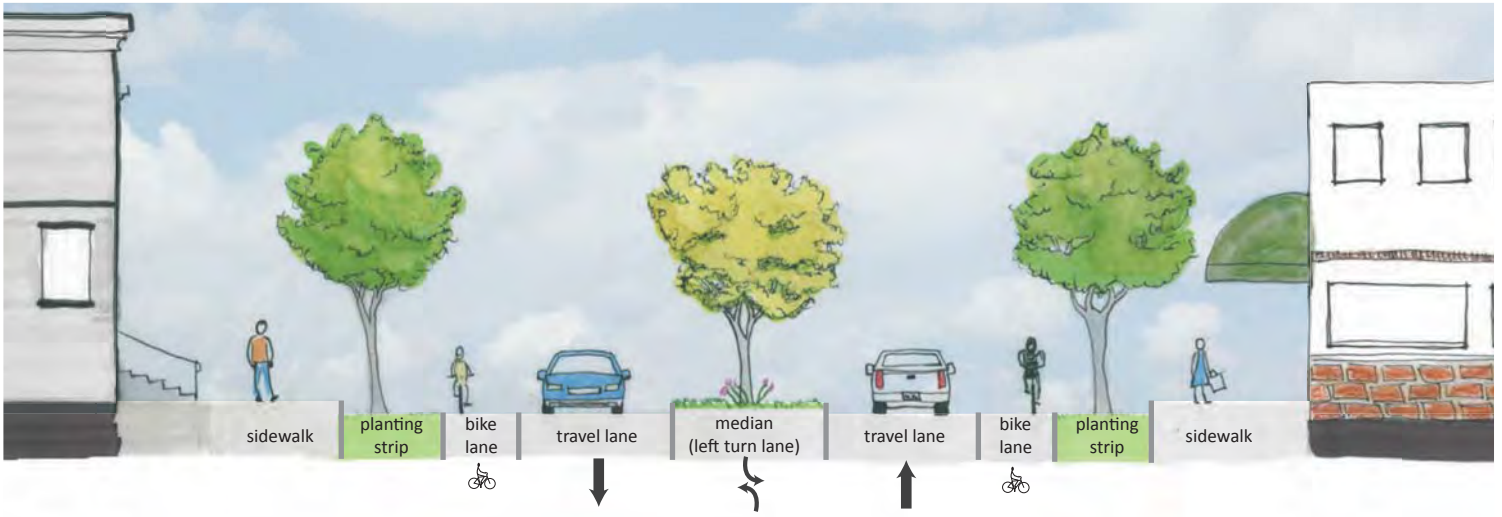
Arterial Street Sections - Center / Village / Mixed Use
